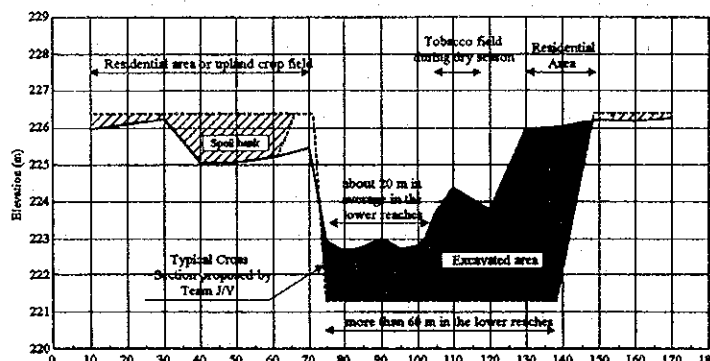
(8)-3 Typical Cross Section Proposed by Team J/V
